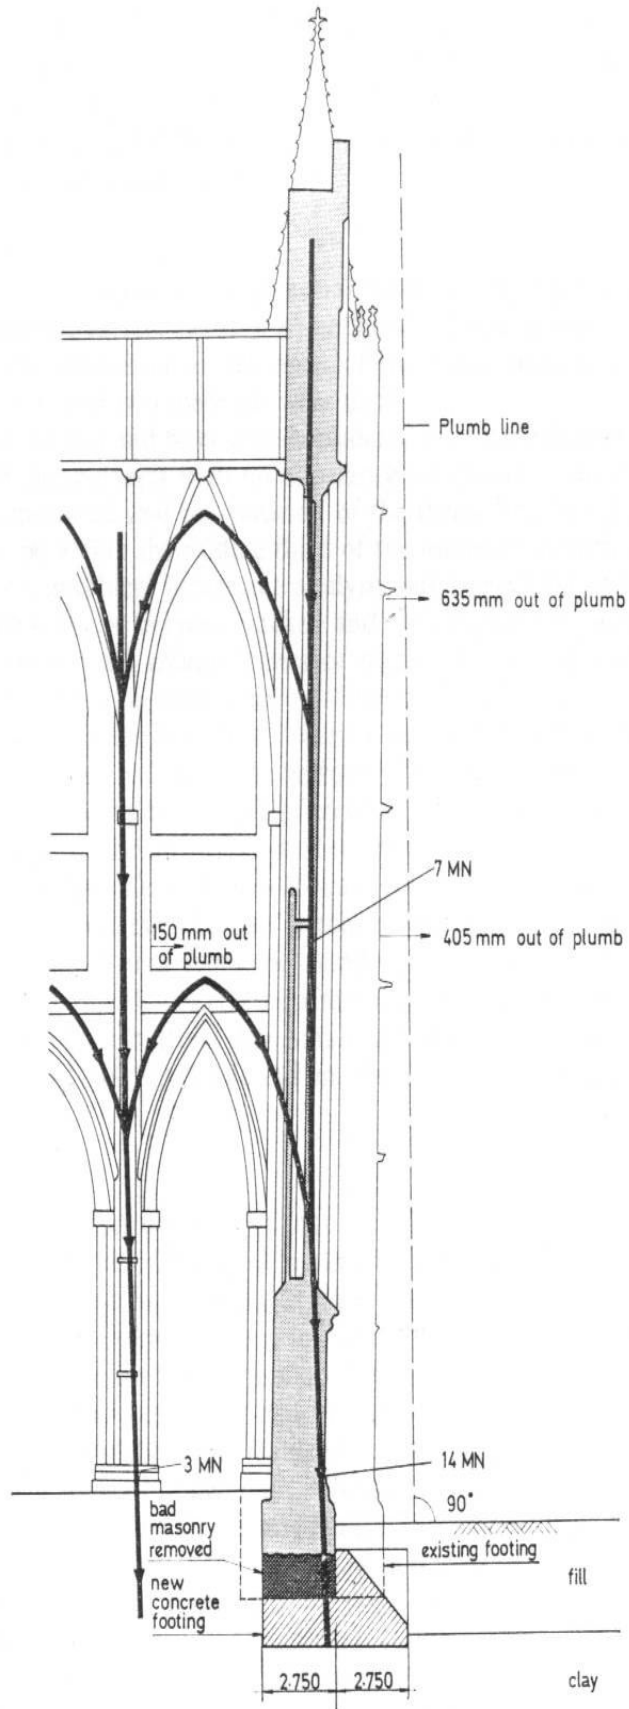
East Front section and plan showing thrusts, movements and new footings (Dowrick and Beckmann 1971, 138, Figure 31)
